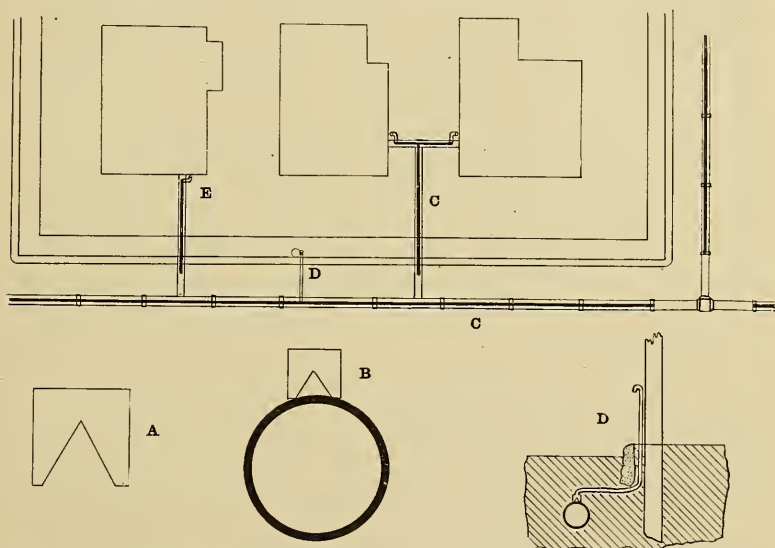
Protective arrangement against injury resulting from leakage of illuminating gas. A, cross section of protective conductor; B, adjustment of same to pipe; C, black lines showing method of arrangement of protective device on street and house service; D and E, vents for leakage.
